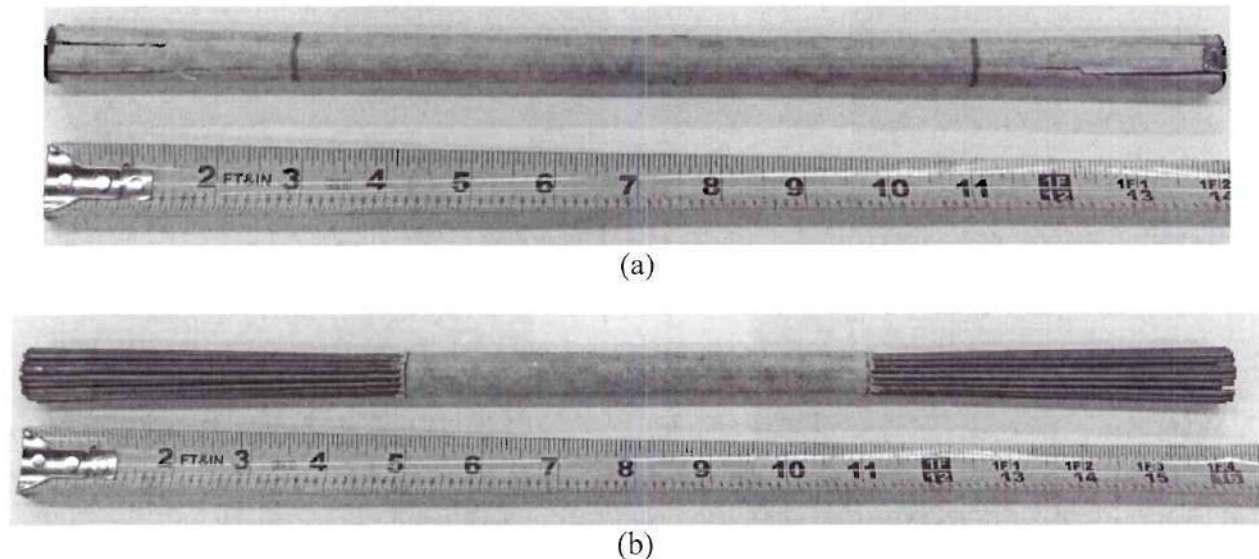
The 15.9 mm (0.625 inch) diameter composite specimens of length (a) 356 mm (14 inches) and (b) 406.4 mm (16 inches) prior to testing (the longer specimen has the composite material removed from the ends)
